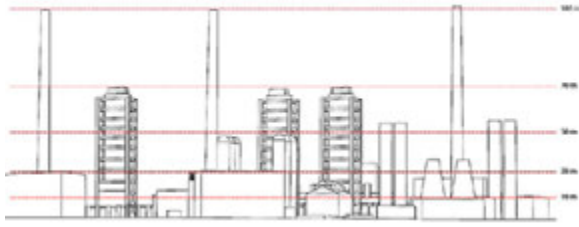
Elevation & dimensions Steelworks complex. (Drawing: Alice Lewis & Author).
